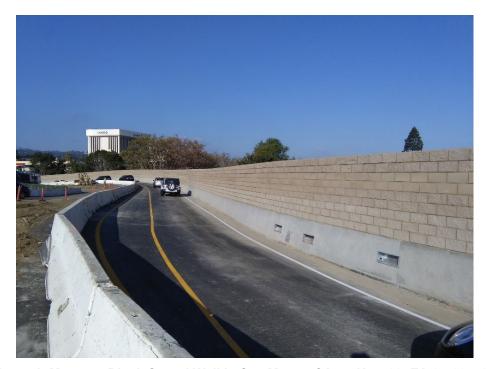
Masonry Block Sound Wall in San Mateo, CA on Hwy 92, EA 04-235524
